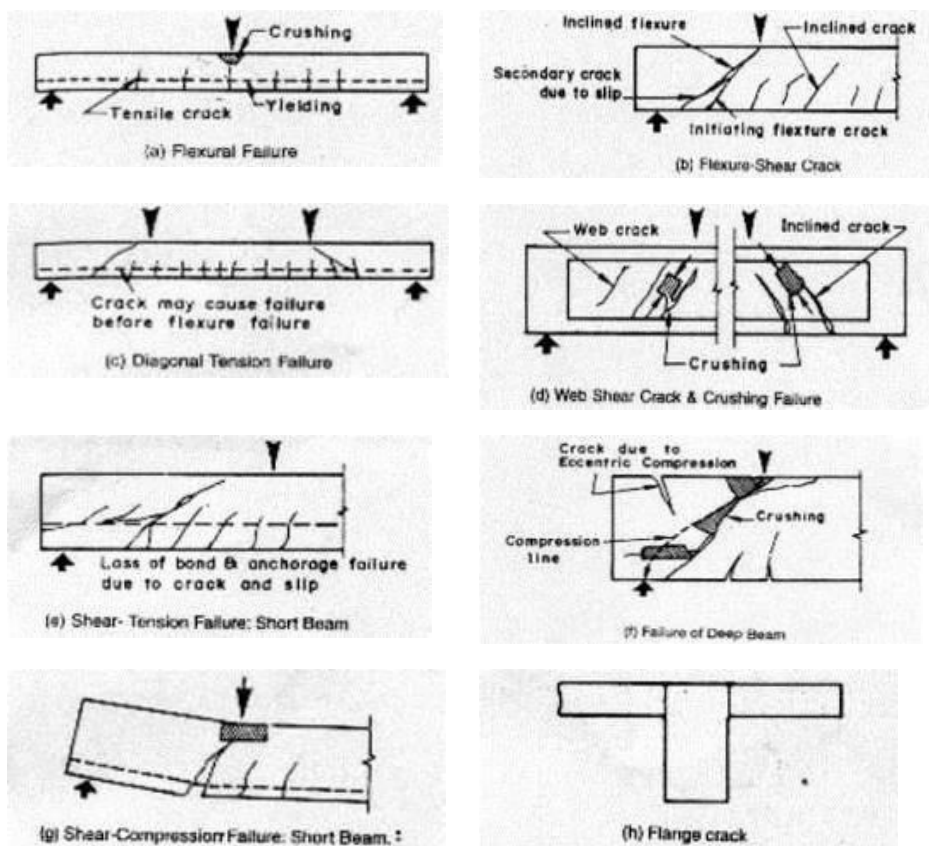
Types of Crack in Reinforced Concrete Beams
